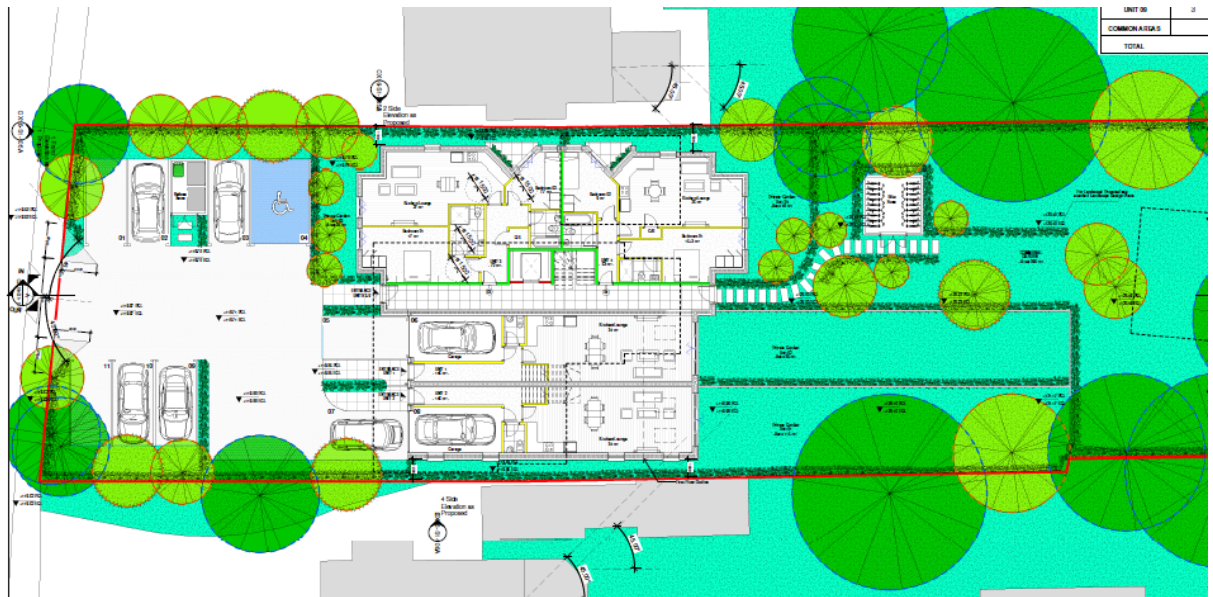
Proposed first floor site plan showing proposal in relation to neighbouring properties
